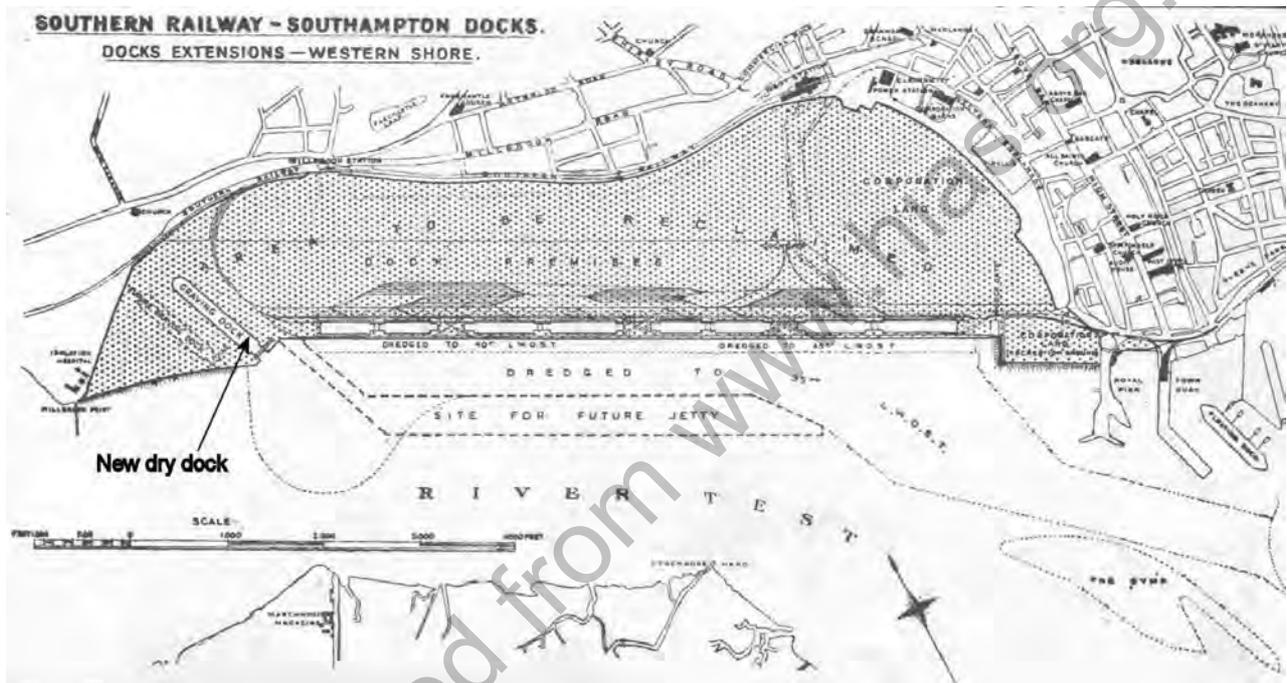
Plan showing the area of the reclamation with the new dry dock on the far left. Space was allowed for a second dock if required. The ‘future jetty’ was never built. (Southern Railway booklet, November 1932)
